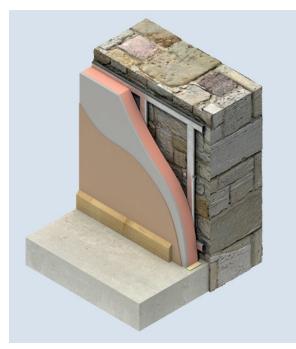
Kingspan* Kooltherm® K118 Insulated Plasterboard installed with Mechanically Fixed Metal Framing System
